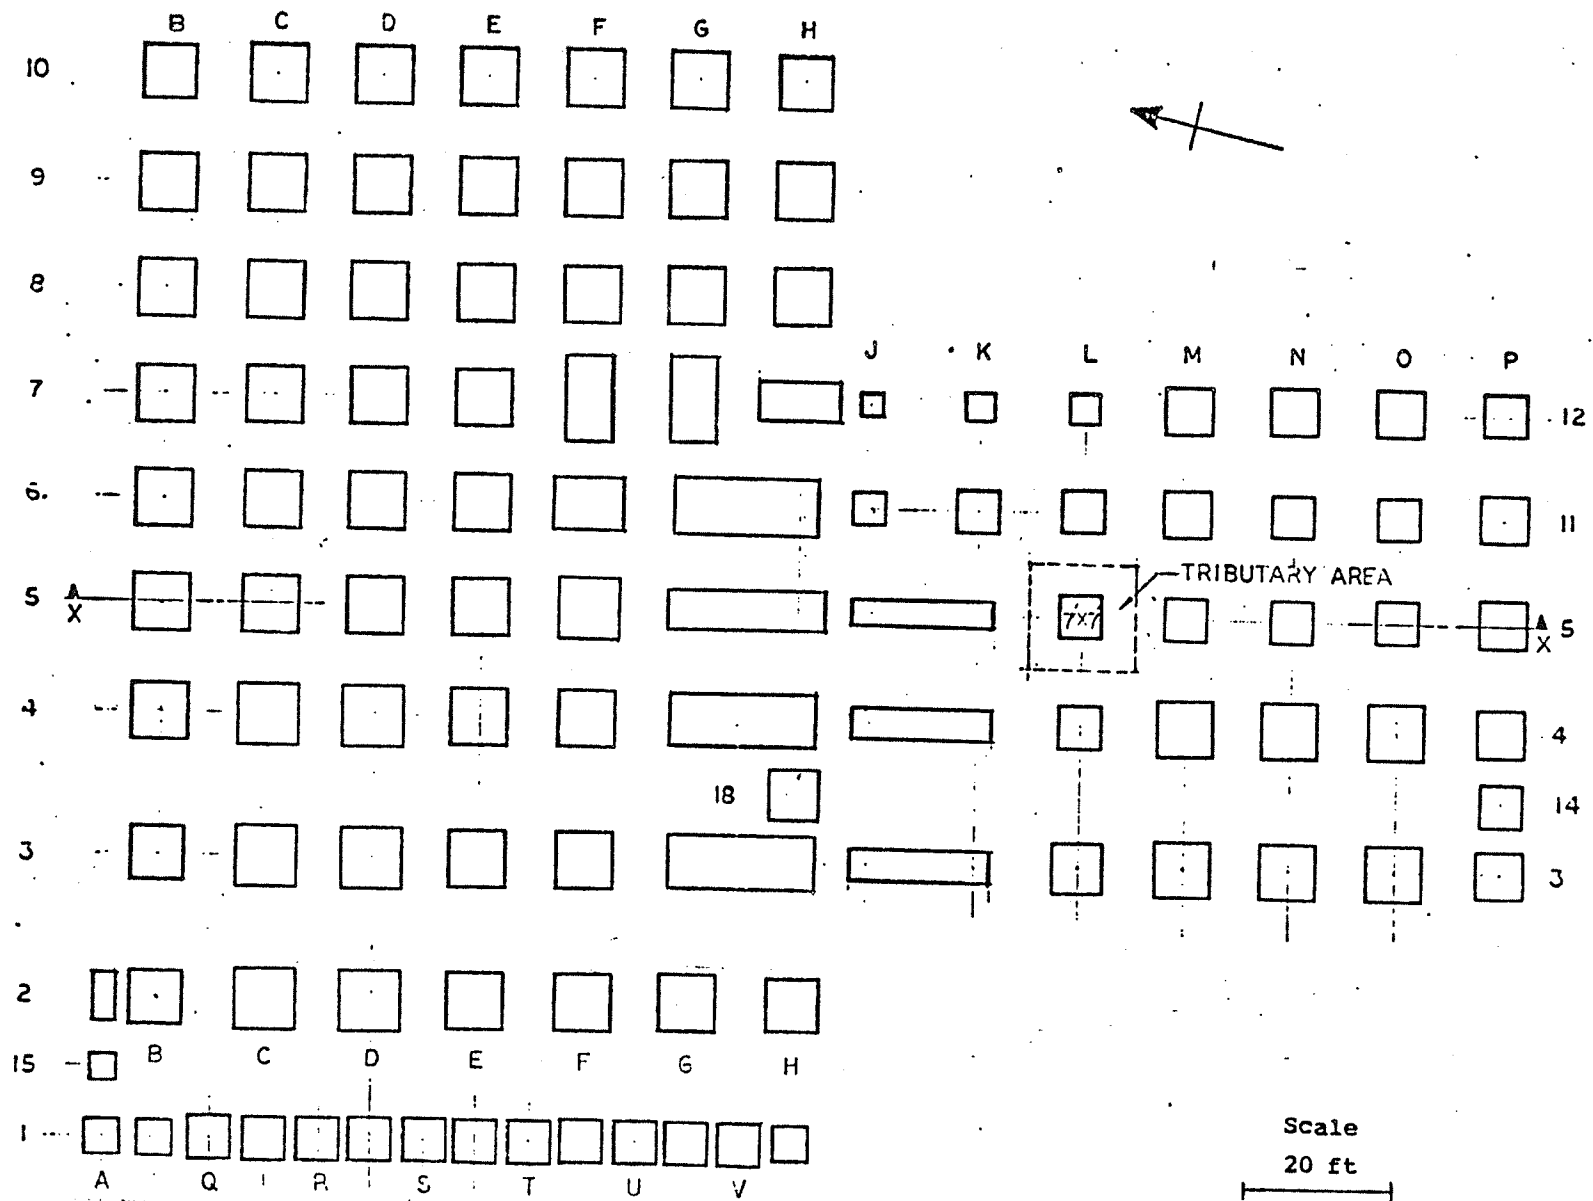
Elizabeth Dafoe Library: Foundation Plan
